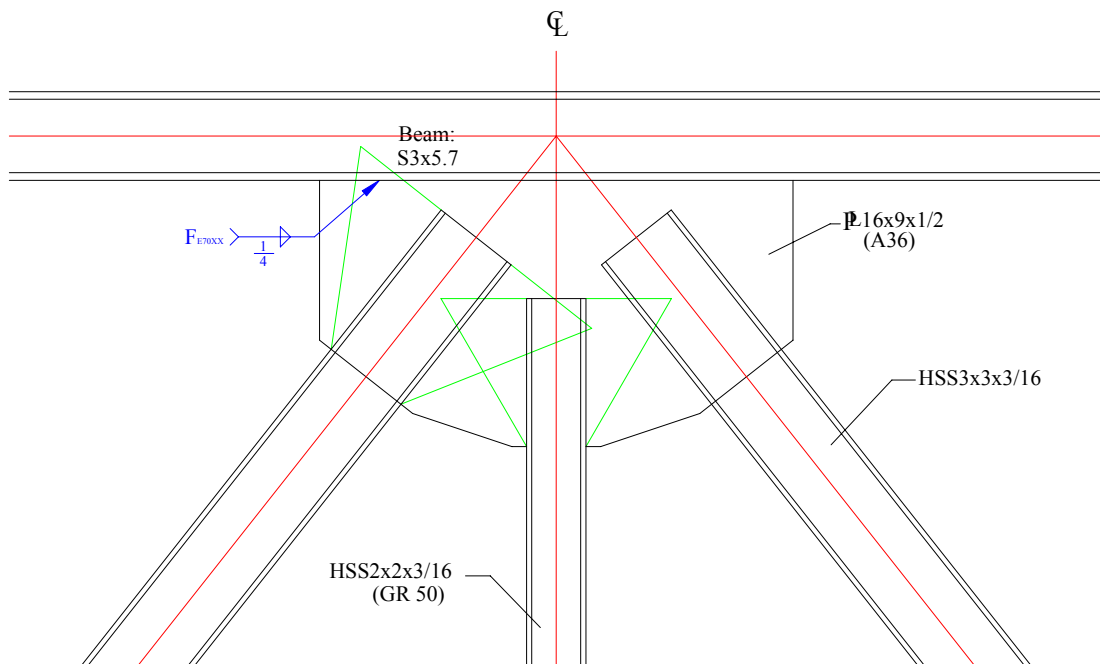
Details of the Roof-floor brace-beam-zipper strut connection.
